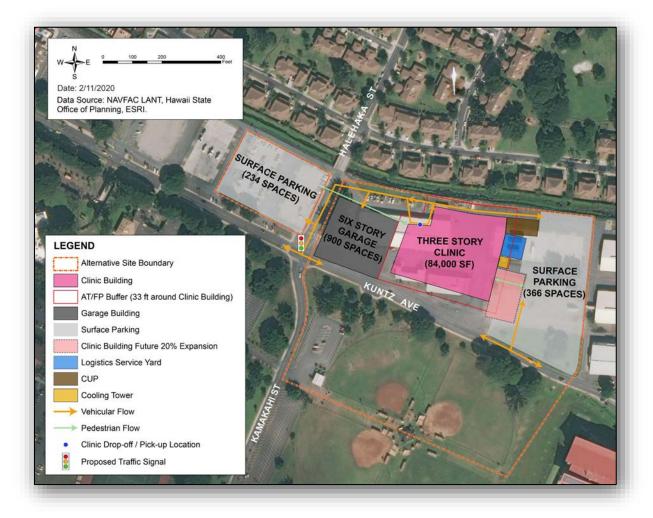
Proposed Conceptual Site Plan of Alternative 2: Kuntz Gate Site
